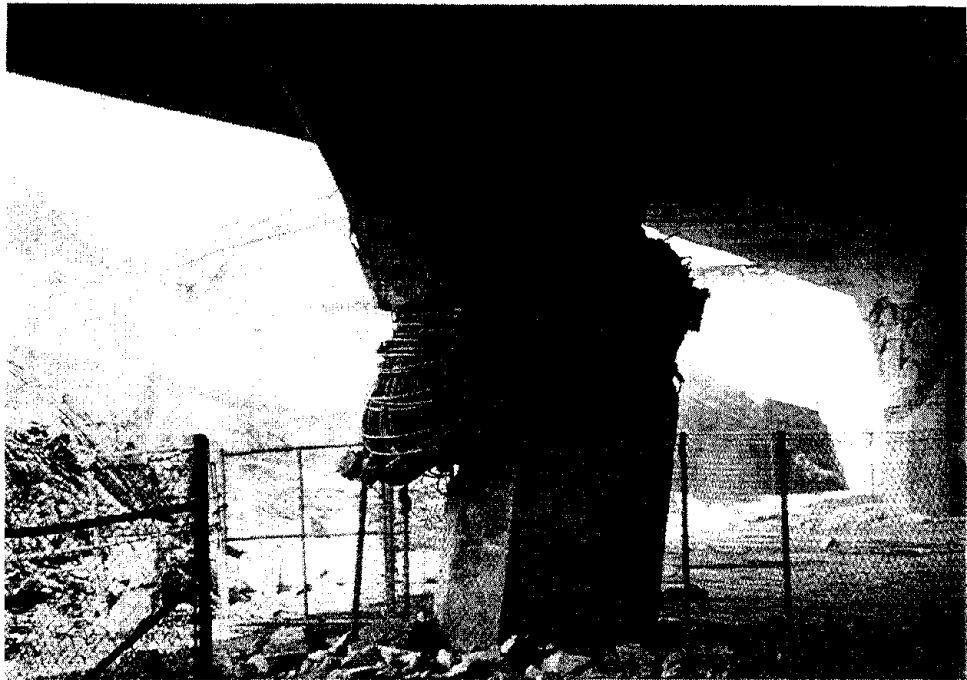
Damage to a pier of the SR118 Mission-Gothic Undercrossing, looking to the northwest at the southernmost pier of Bent 3 of the westbound bridge.
